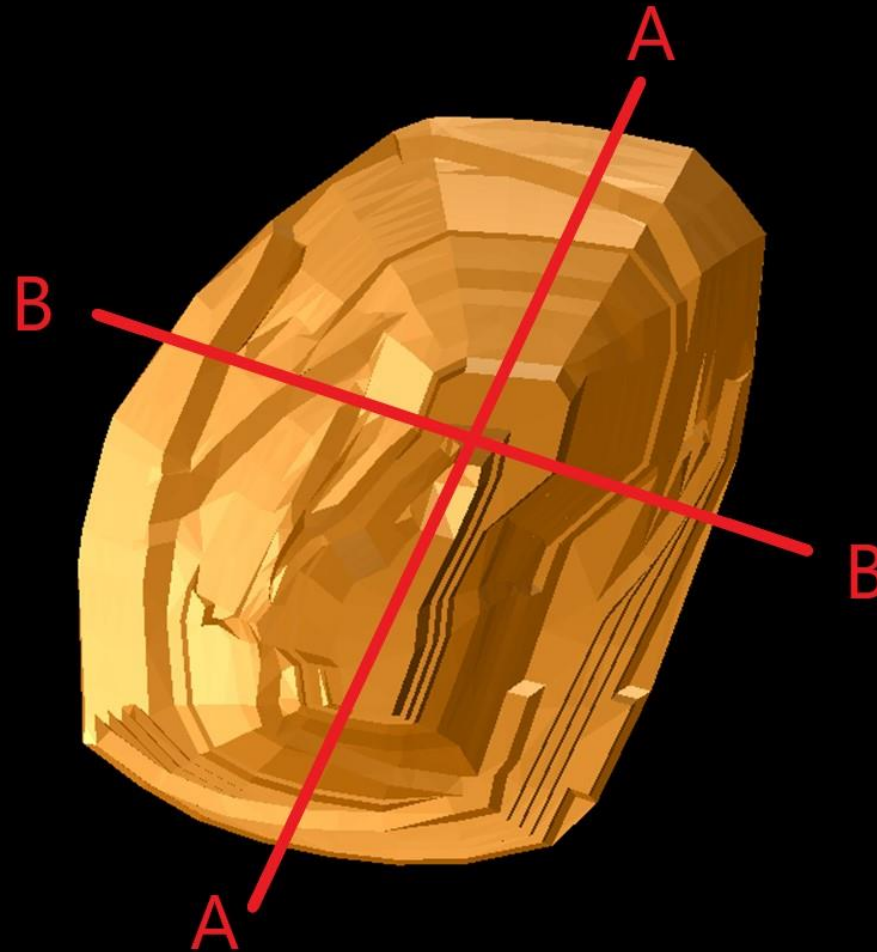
Open pit (Updated Design) Cross-Section Schematic Viewed from North
